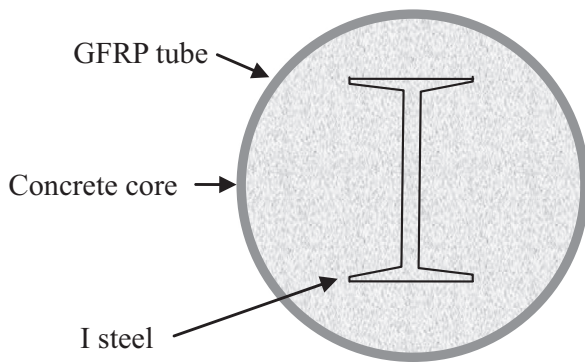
Sketch of cross section of steel reinforced concrete-filled GFRP tube.
